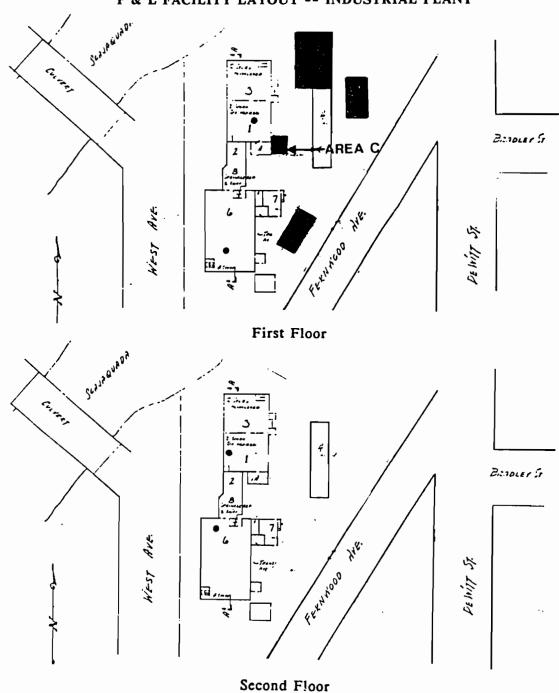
P & L FACILITY LAYOUT -- INDUSTRIAL PLANT
